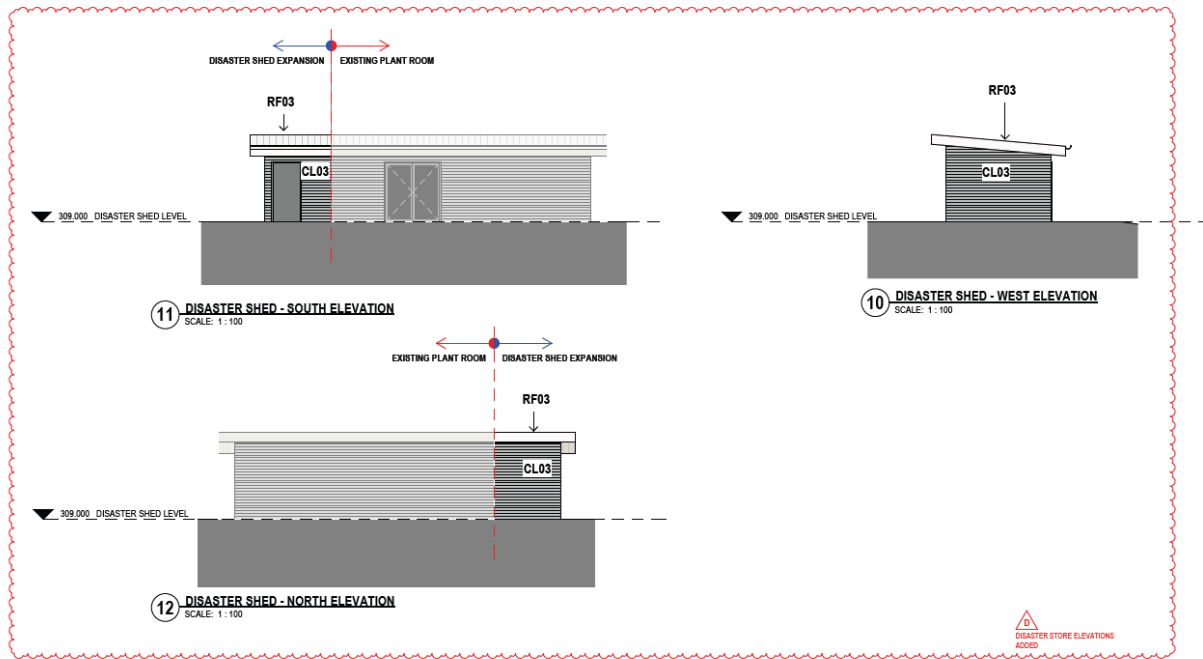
Proposed elevation of the new relocated Disaster Store (STH)
